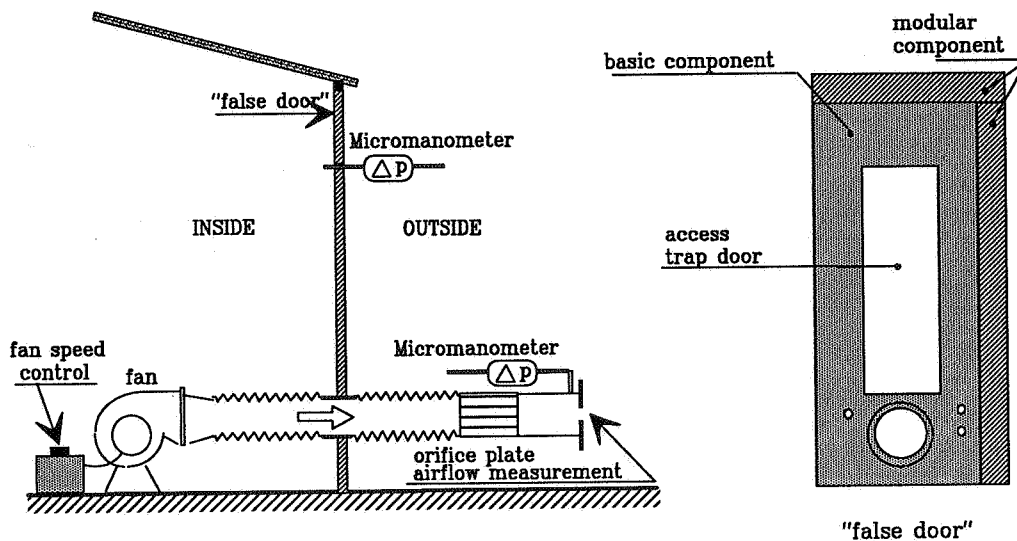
sketch of dwelling airtightness test equipment "fausse-porte CSTB"
